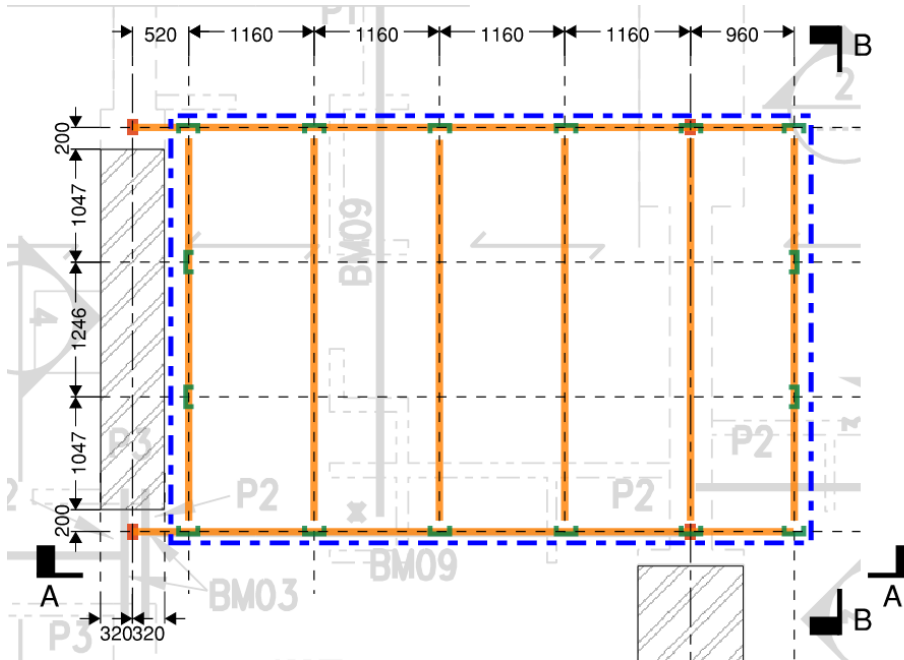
Proposed base frame structural arrangement and setting out, allowing for studs (red) to transfer load to the brick walls under. In this orientation, the frame must cantilever beyond the rightmost brick wall (under)
